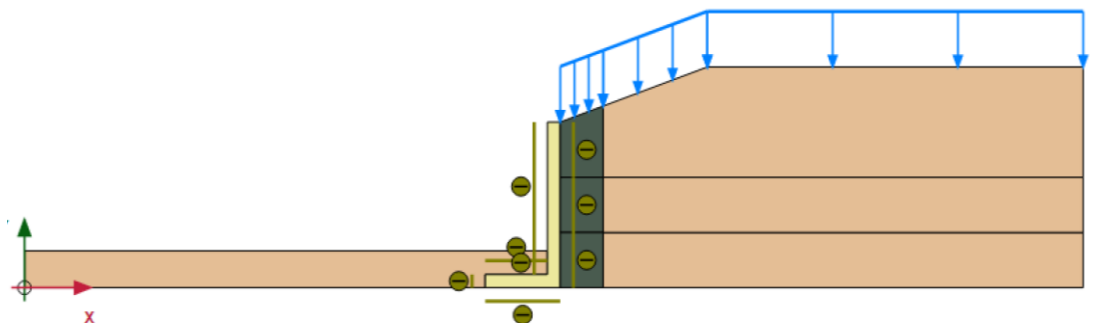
Retaining wall with backfill slope 20° and 1.2m TDA backfill
